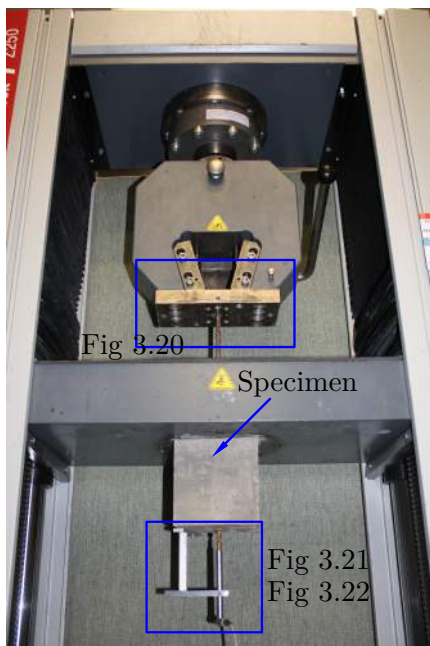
A view of the PO test setup showing the testing machine bearing on the top concrete face and indirectly applying a load to the fixed rebar.
